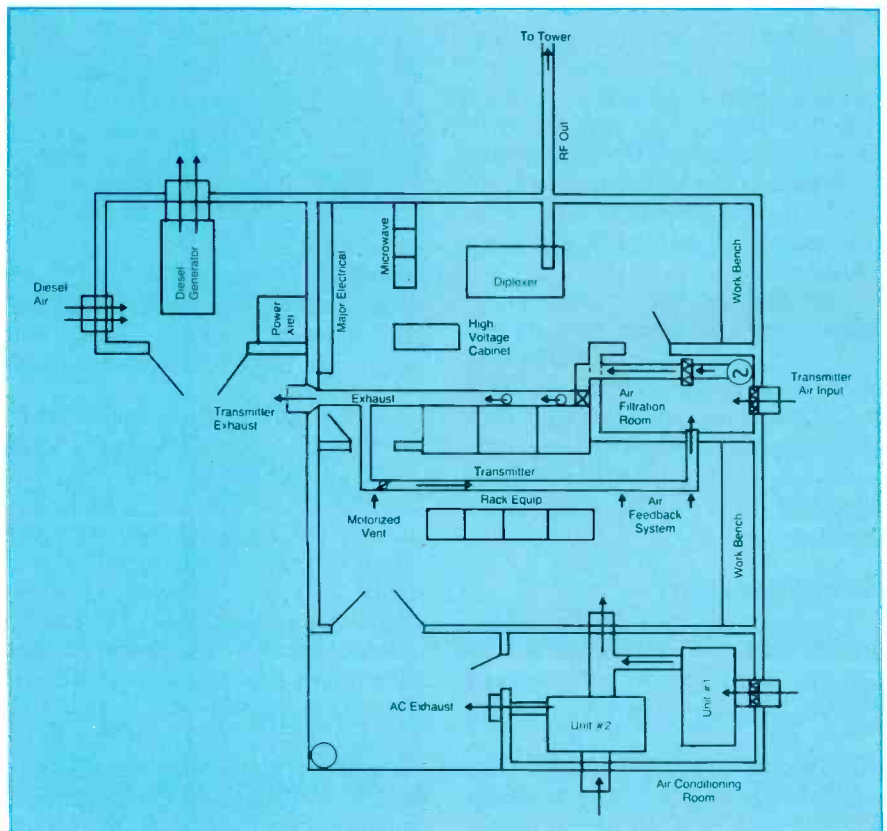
Plan of the KLRN site showing air flows and equipment positioning.
